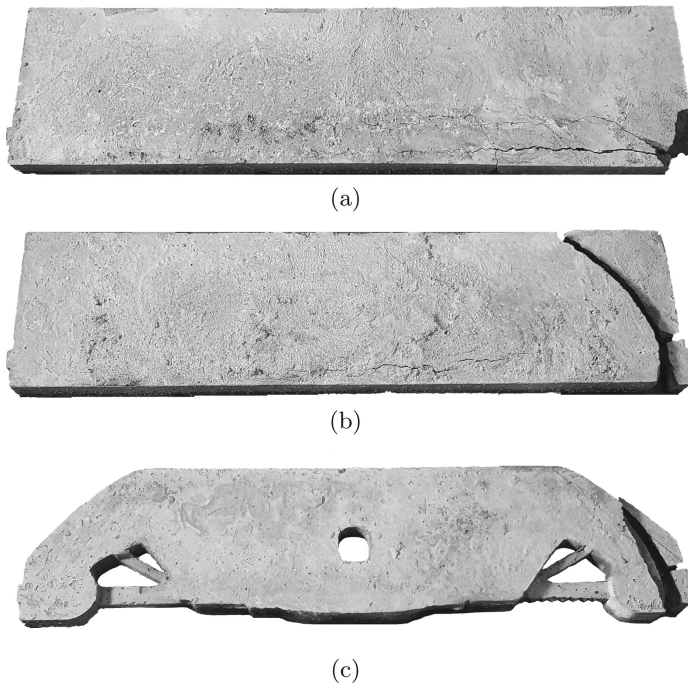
Beam failures observed for (a) the standard beams, (b) the topology-optimized beams with 100% concrete volume, and (c) the topology-optimized beams with 75% concrete volume.
